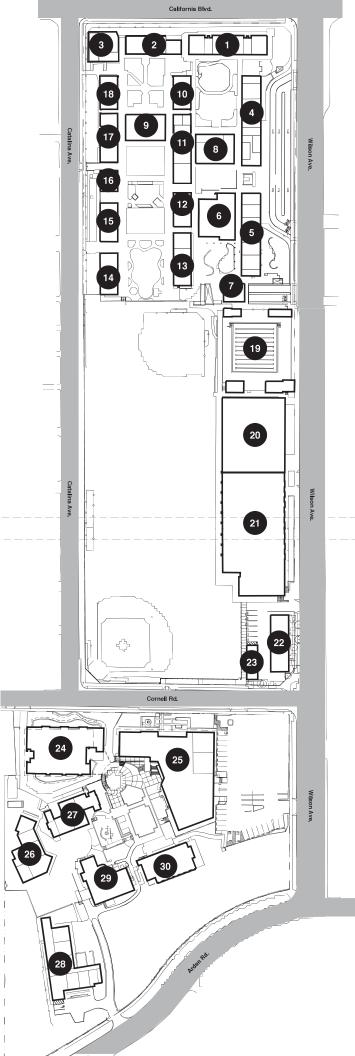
Existing Buildings Polytechnic School 2017 Master Development Plan
